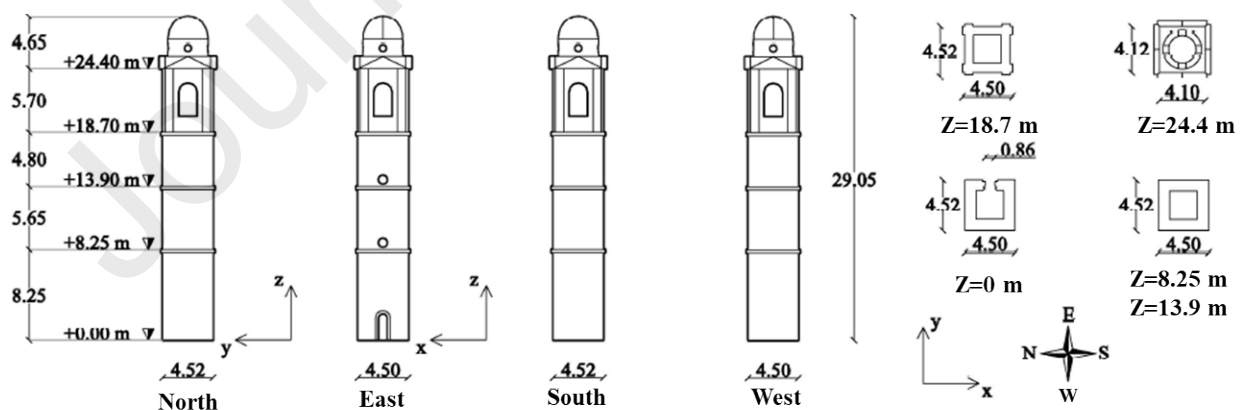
Tower 1. Elevation views, plan and relevant sections of the bell tower with indication of the main geometrical dimensions.
